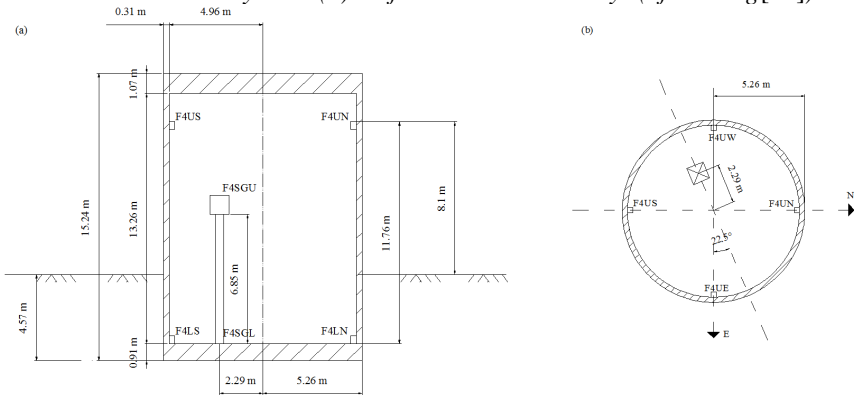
Location of accelerometers on the 1/4-scale model of the containment structure: (a) vertical and (b) horizontal cross-section (modified from [11])
